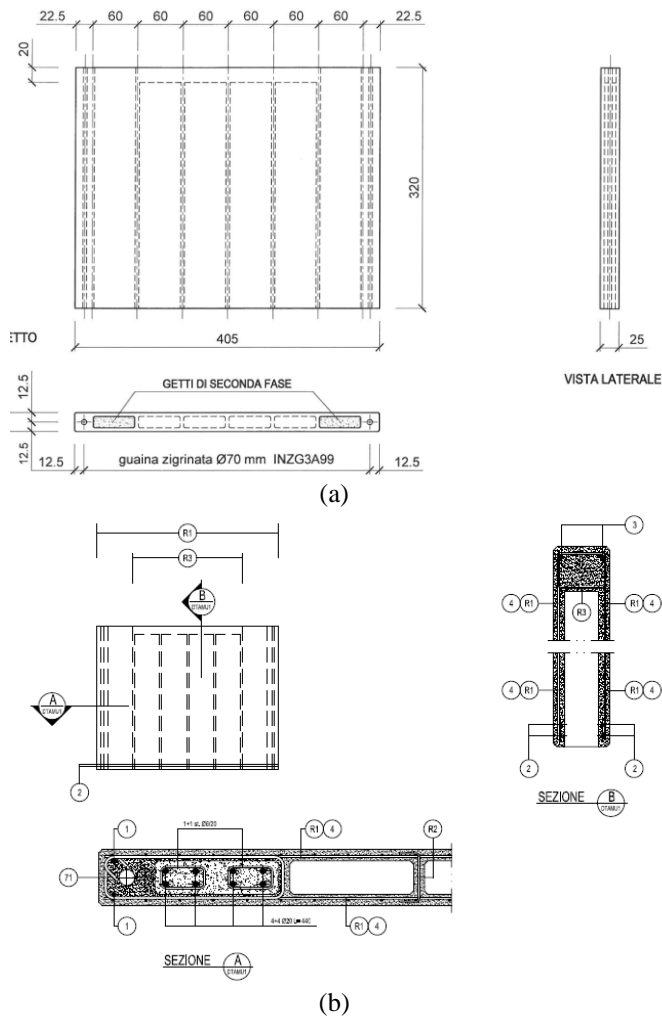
One modulus of Master[®] wall used in the ELSA/JRC prototype: (a) sections, (b) reinforcement details / Un modulo di muro Master[®] utilizzato nel prototipo ELSA/JRC: (a) carpenteria, (b) dettagli di armatura.
